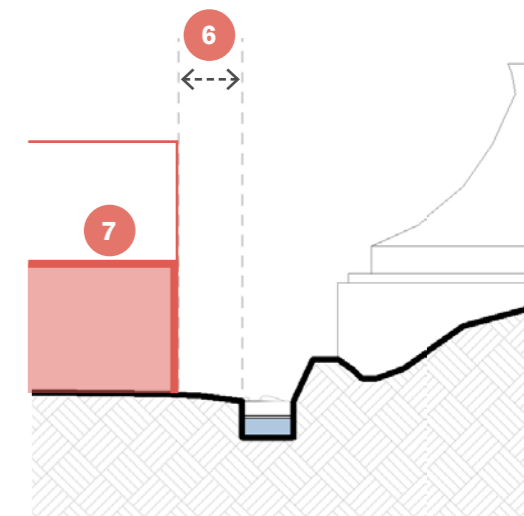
Section E showing built form fronting Clay Cliff Creek Channel Walk next to OLOLC
